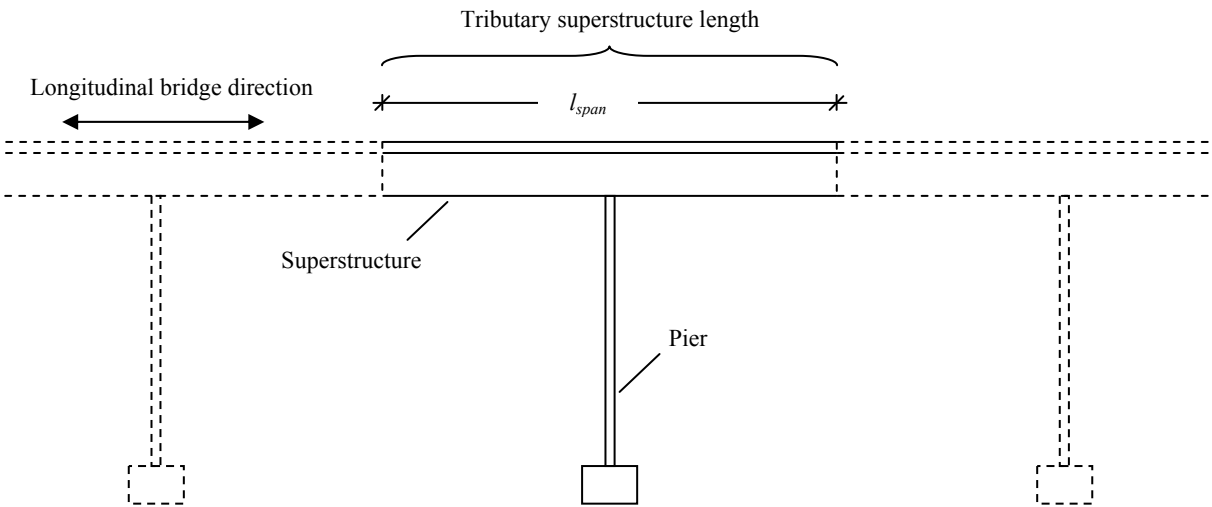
Elevation of regular bridge in longitudinal direction
